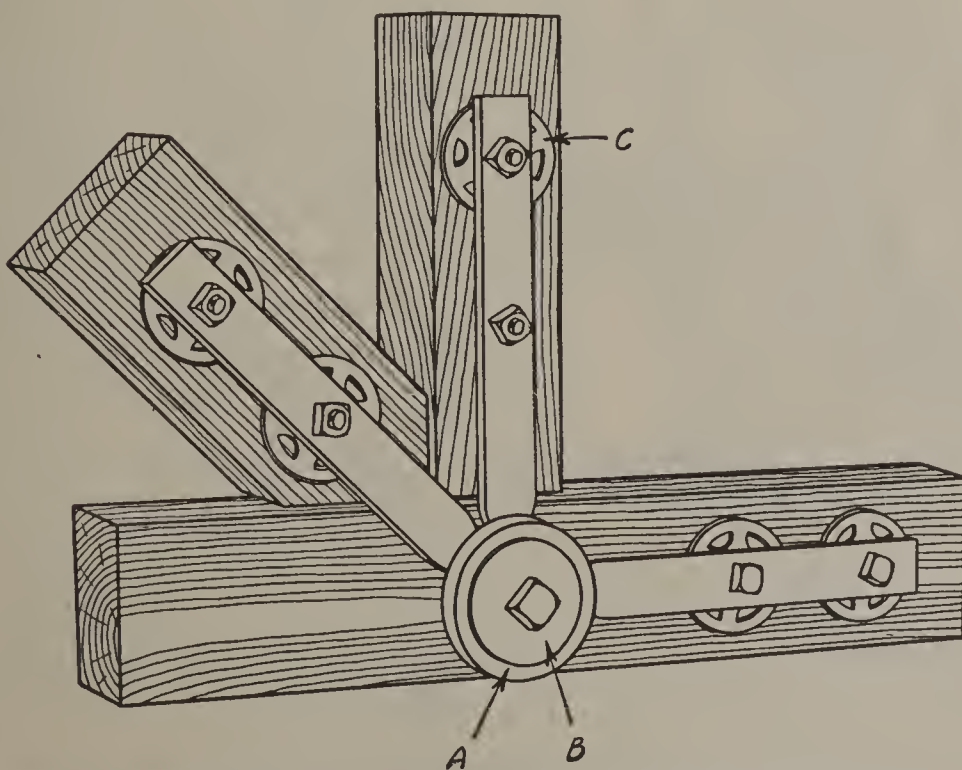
Siemens-Bauunion hinge-connector assembly: *A*, Heavy steel ring; *B*, mushroom-shaped locking wedge; *C*, claw plate.
